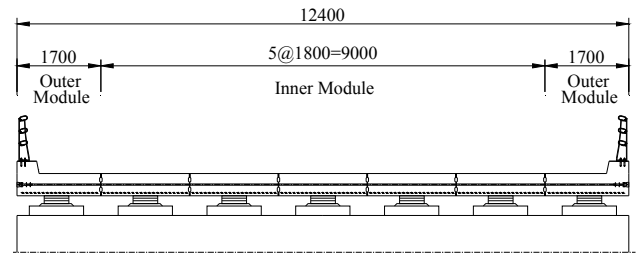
Cross-section of the slab-type precast modular bridge (L=10.0 m)
